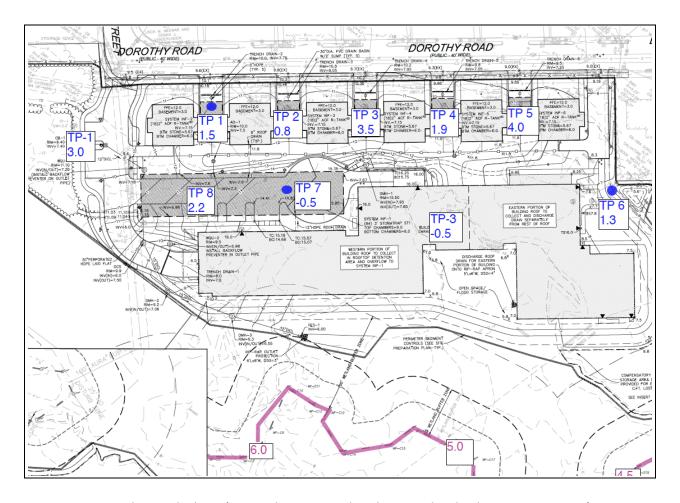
Site Plan Hydrology (Groundwater Levels -Blue, Wetlands Elevations - Green)
